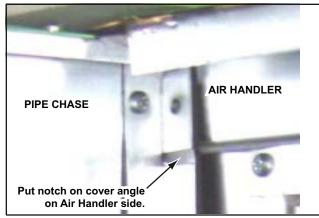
PROPER POSITIONING OF COVER ANGLE WITH NOTCH ON AIR HANDLER SIDE
